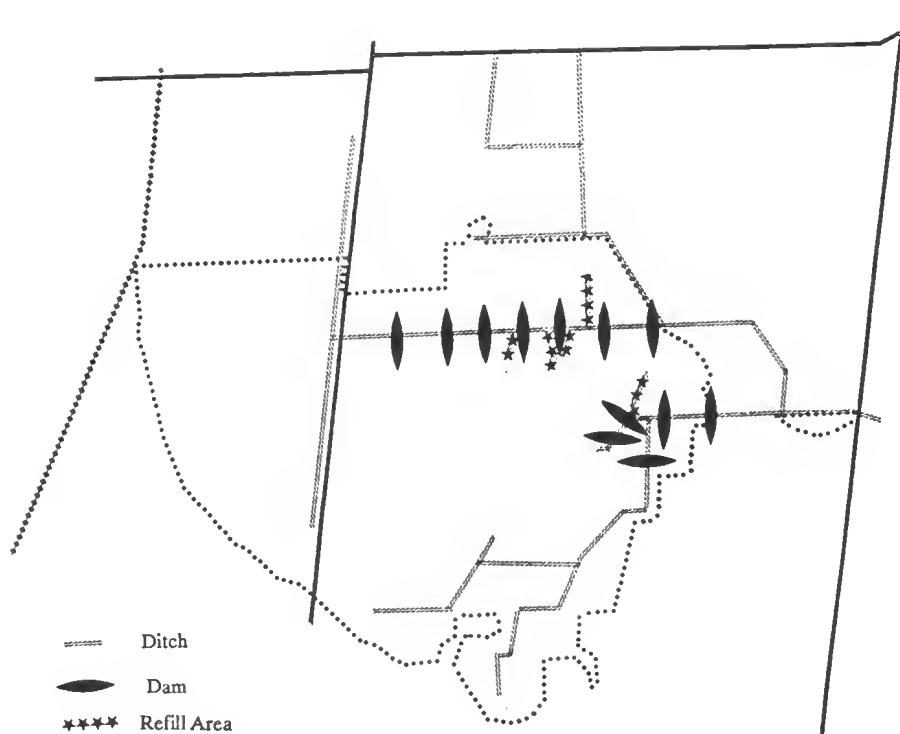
Suggested damming and refilling of existing ditches to elevate water table
